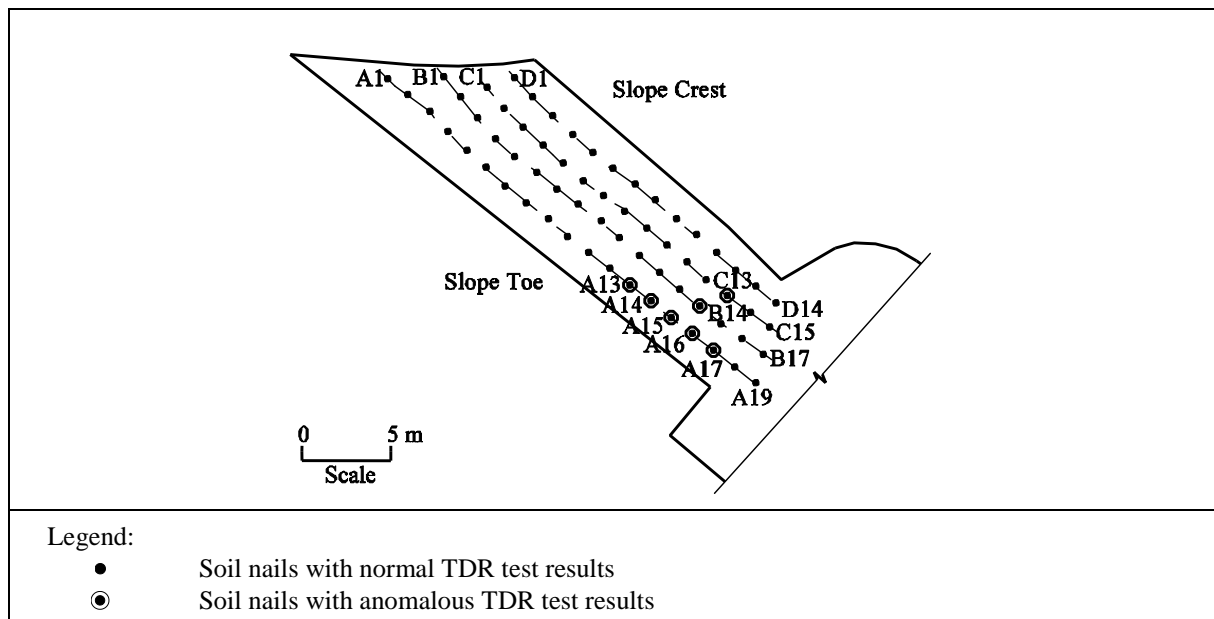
Layout of Soil Nails at the Northern Portion of the Slope
